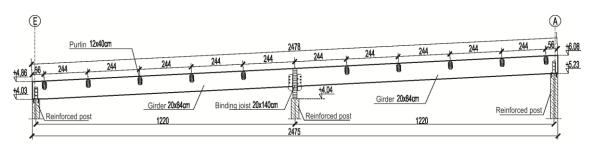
Construction solution based on glued-wood girders *Source: Own study.
